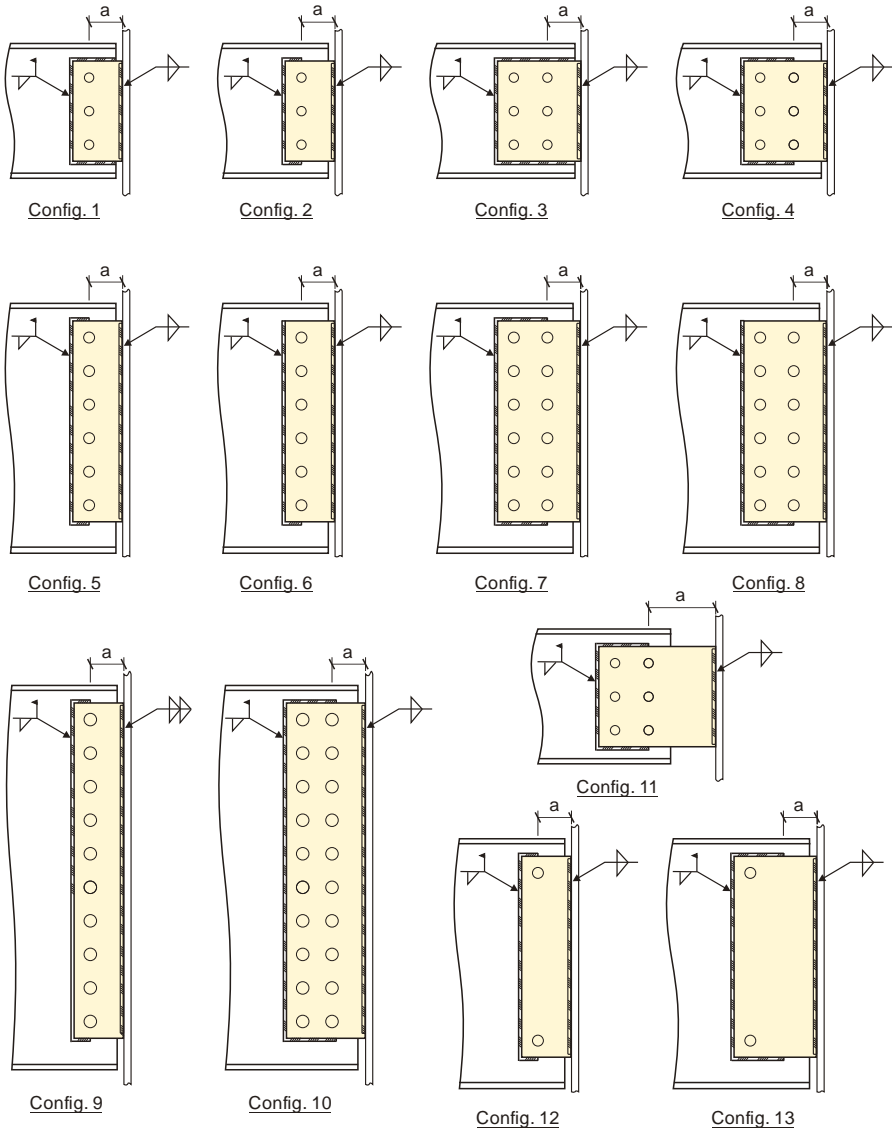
Detail drawings of weld-retrofit shear tab connections
